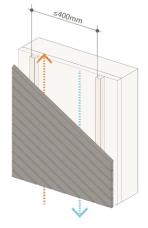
Single-layer frame when cladding boards are installed at an angle less than 45°
